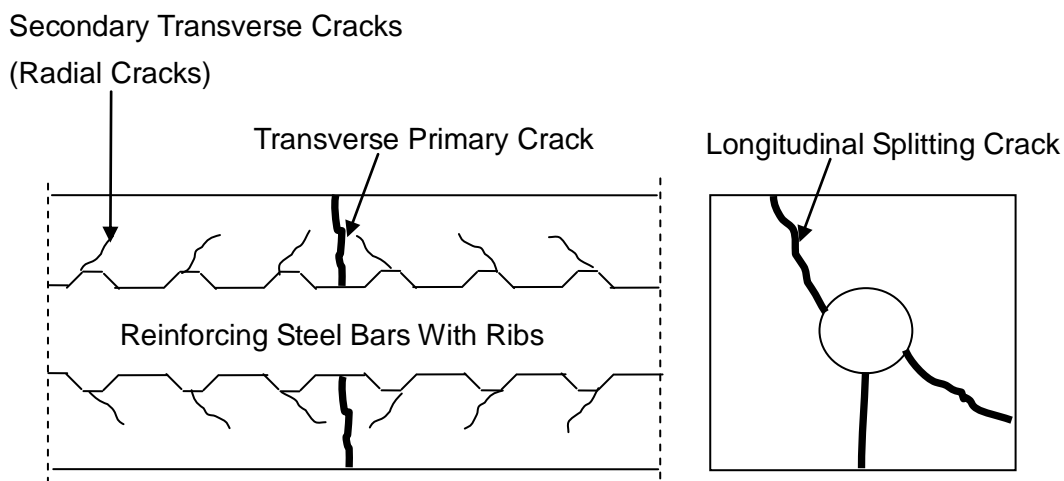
Cracks formed in reinforced concrete beams (Tassios, 1979; CEB Bulletin No. 151, 1982)
